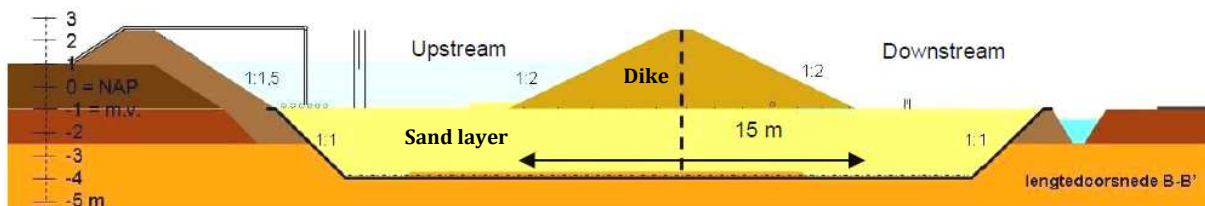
Example of a cross section of the full-scale experiment (van Beek *et al.*, 2010).
